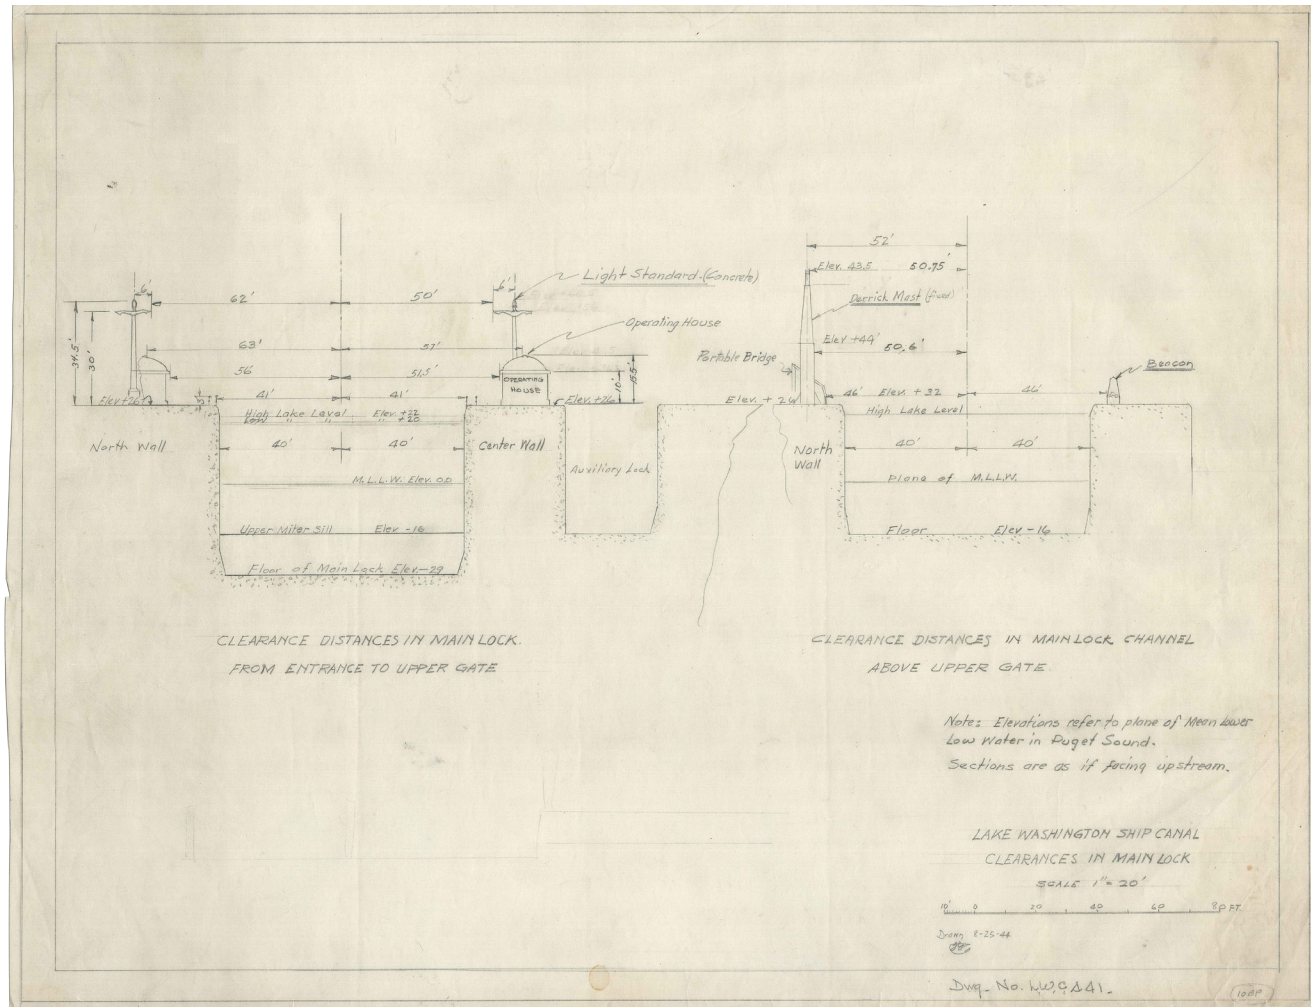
Today the lakes' water elevation fluctuates two feet each year. The USACE controls this elevation via the spillway dam. Opposite to historical conditions, the lakes are at their highest in the summer (about 22 feet above MLLW) and lowest in the winter (about 20 feet above MLLW).
